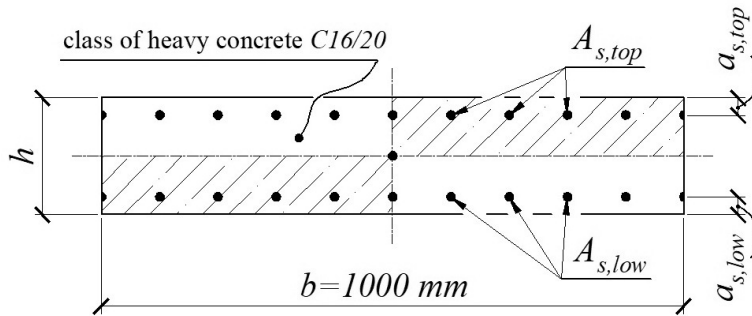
Geometric dimensions and normal section reinforcement scheme of reinforced concrete slab
